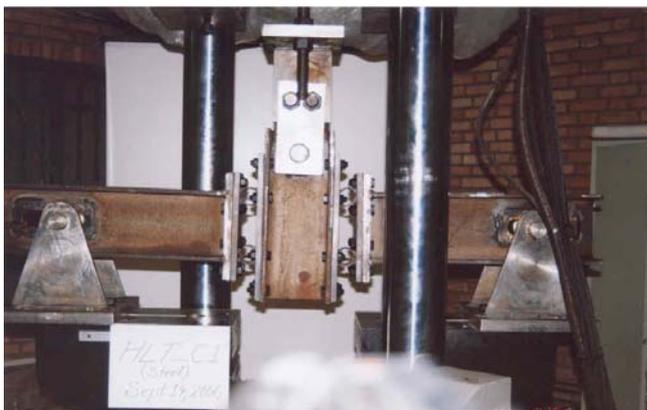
First test assembly, with HLT-C1 specimens, at its utmost lower position, before failure.
